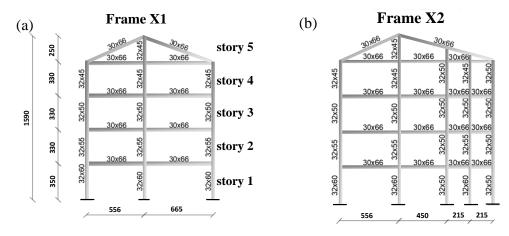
Details of the RC frames that constitute the structure including cross-sections of main218members in X direction [26]. Dimensions in centimeters.219
